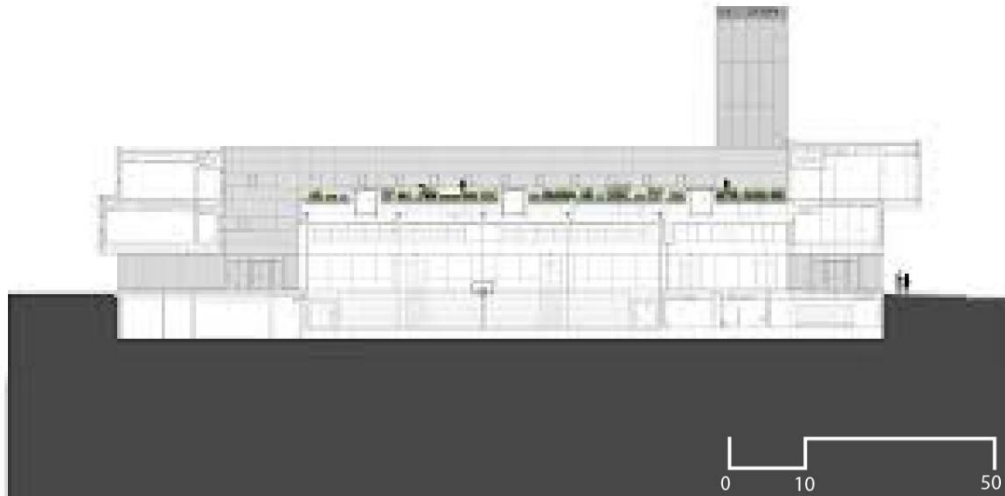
Northwest – Southeast section cut of the building showing spaces below and around the green roof. Gary Comer Youth Center designed by John Ronan Architects in 2006. (HoerrSchaudt, 2006). <https://hoerschaudt.com/project/gary-comer-youth-center/>
